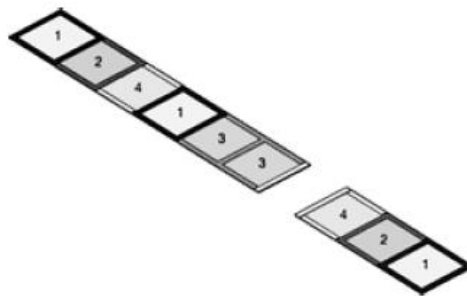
Evolution of a row of buildings, (Carocci, 2004) 1 isolated building, 2 building built adjacent to the previous one; 3 contemporary buildings built adjacent to the previous ones; 4 building built between existing buildings, 5 demolished building
